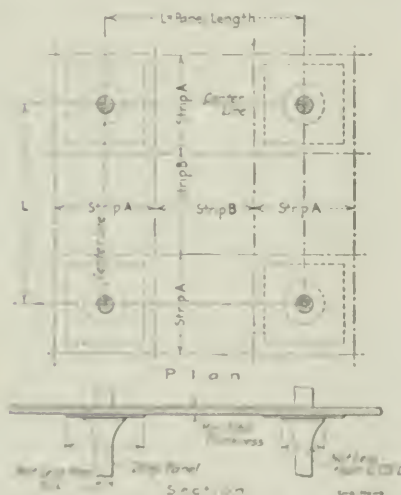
TYPICAL FLAT-SLAB FLOOR AS DESCRIBED IN NEW CHICAGO BUILDING RULING
